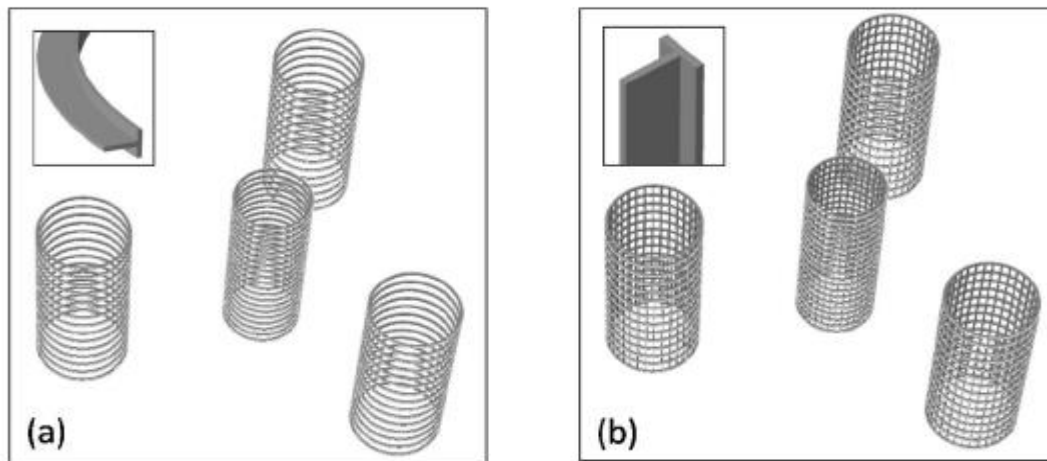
T-profile longitudinal and ring stiffeners assembled inside column cylinders [12]
